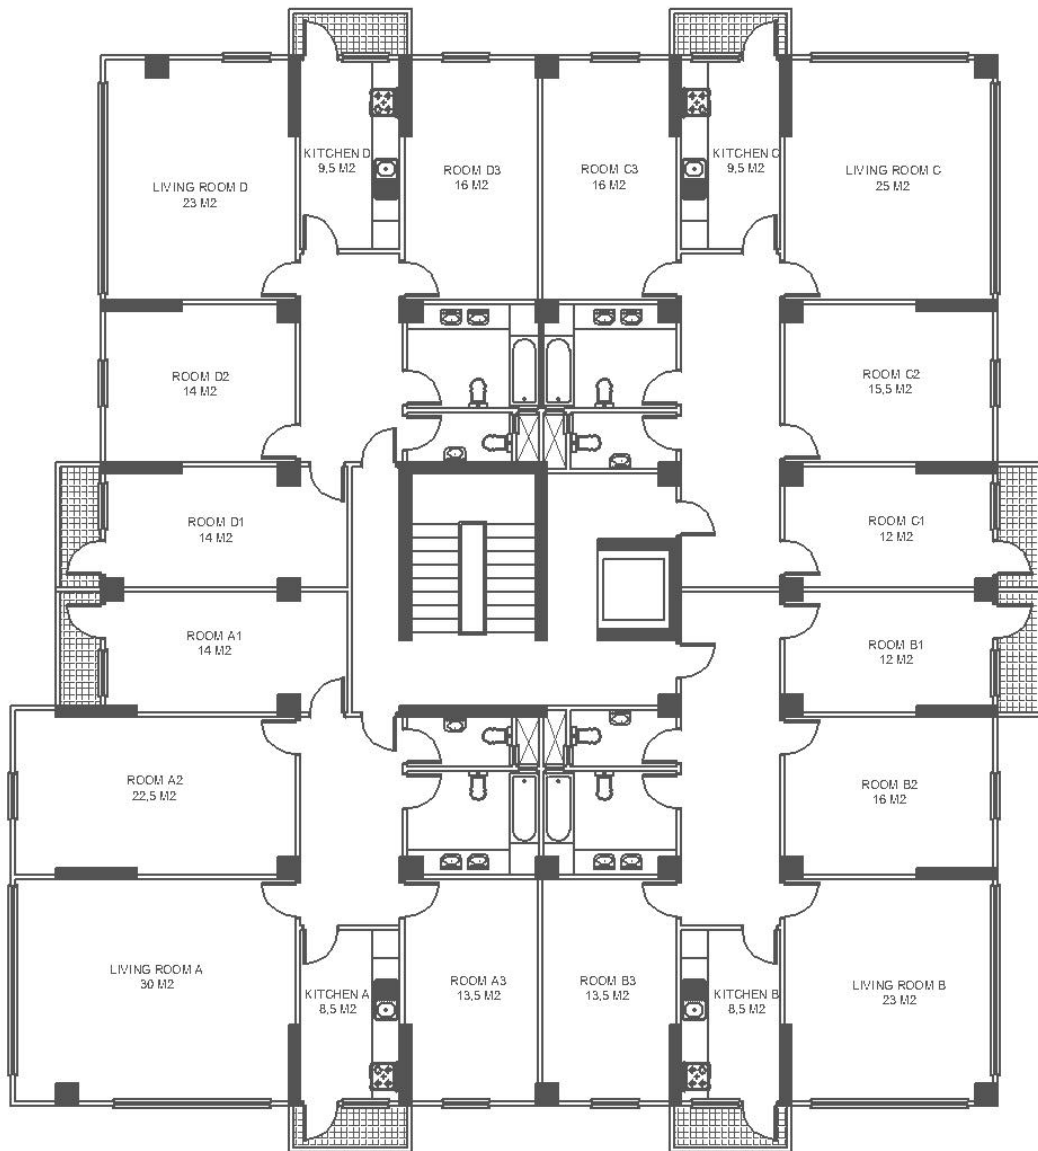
Architectural Plan of Model-3 with Regular Structural System
